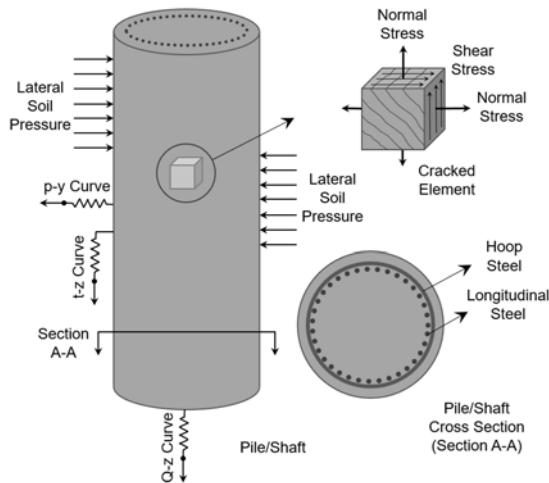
Soil Loads and Formation of Cracks in a Typical Reinforced Concrete Pile or Shaft
